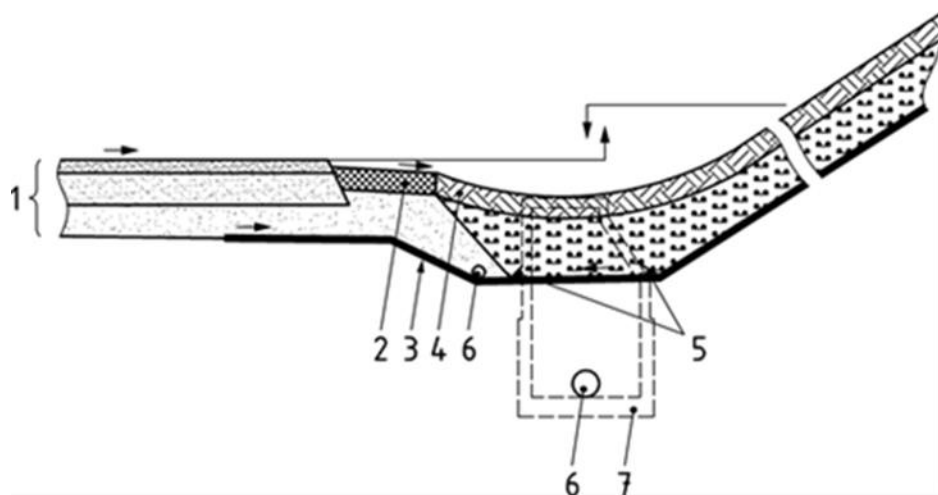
Typical cross section of geosynthetic barrier system under a road for groundwater protection (1 pavement, 2 side embankment, 3 geosynthetic barrier (GBR), 4 cover soil, 5 sealing connection, 6 collection pipe, 7 manhole)
